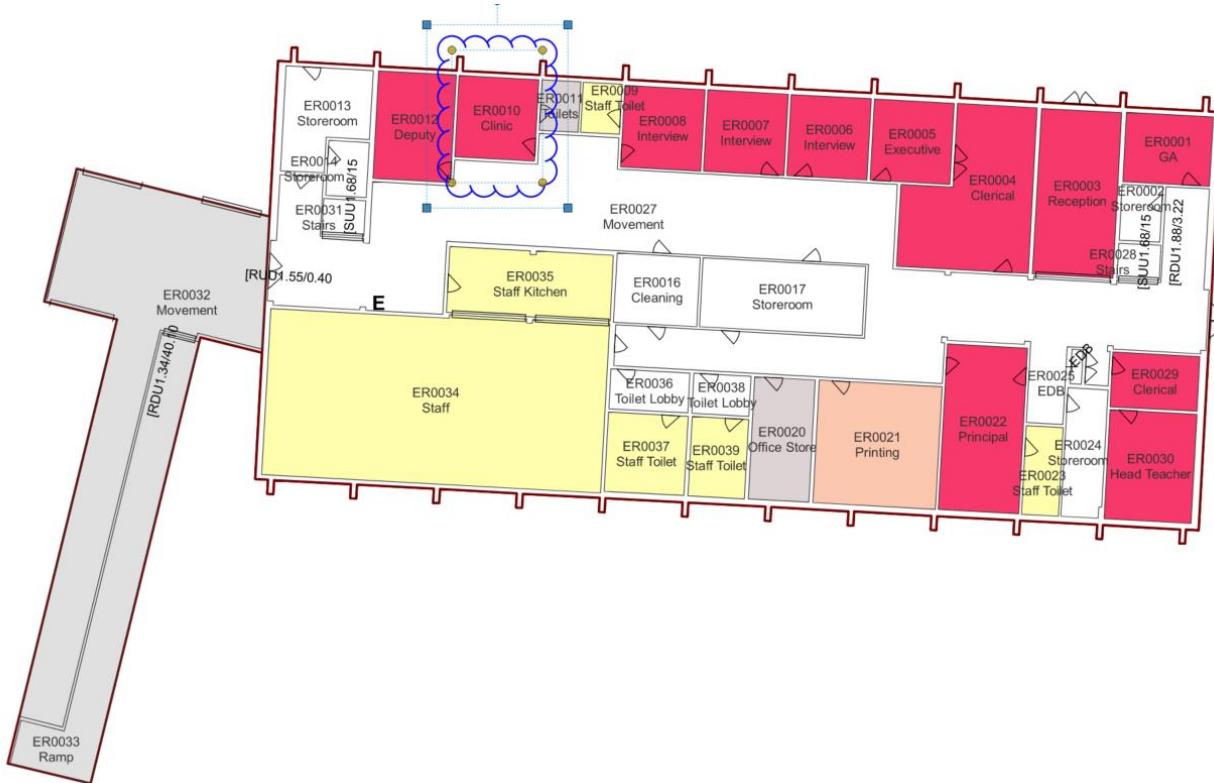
Block E Floor Plan Showing the Location of Clinic ER0010 and GA Room ER0001
